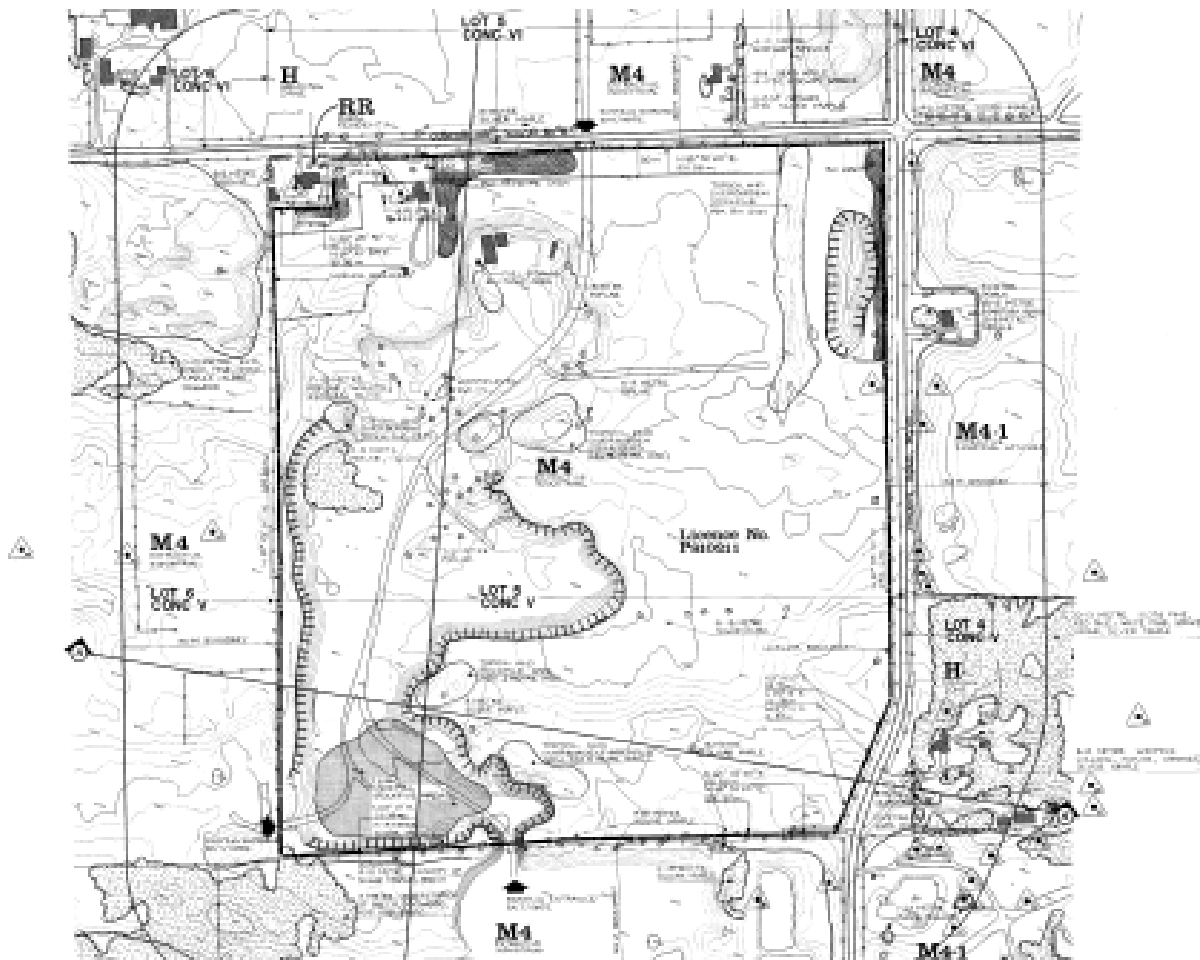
ARA approved site plan for proposed extension of Talbot Pit (Source: Harrington and Hoyle Ltd., March 1993)
